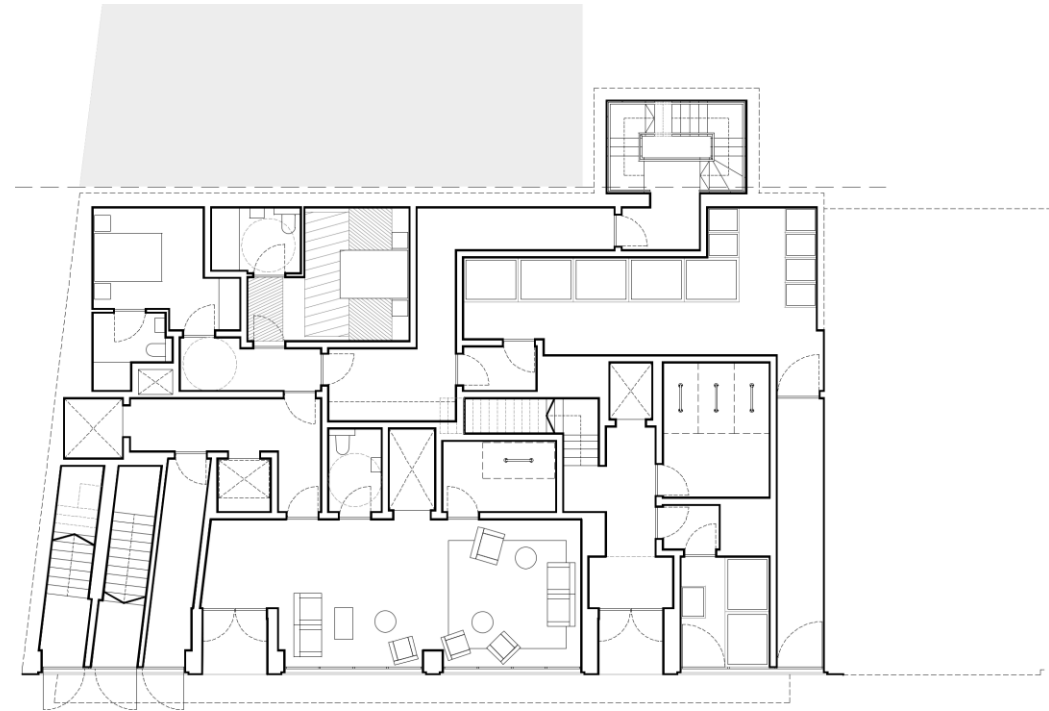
Proposed ground floor plan showing the commercial space, hotel ancillaries.
